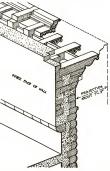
Renaissance masonry. Wall and cornice at the Strozzi Palace, Florence.
